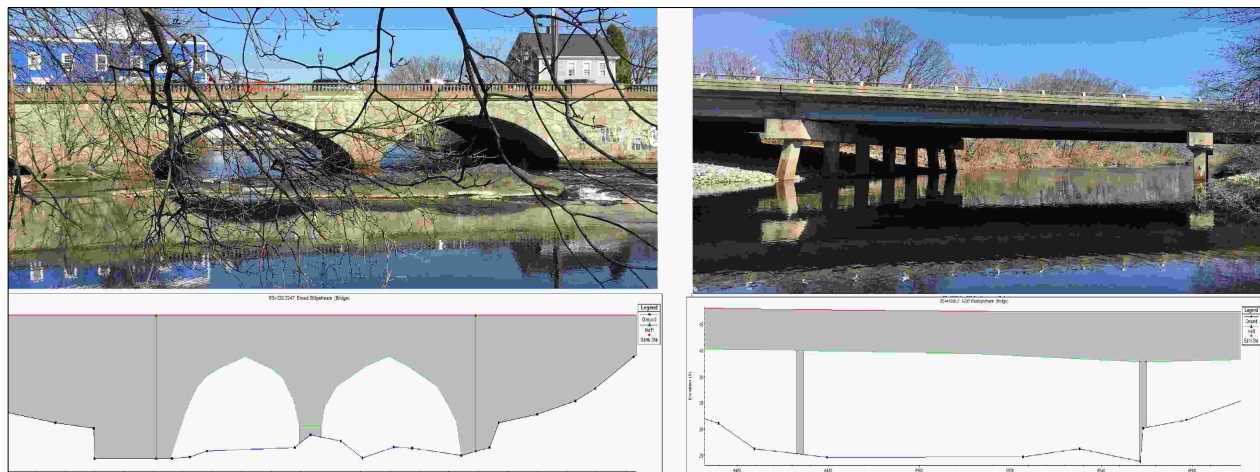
Examples of bridge structures models. The Pawtuxet Village Bridge (left), and I-295 West Ramp Bridge (right).
